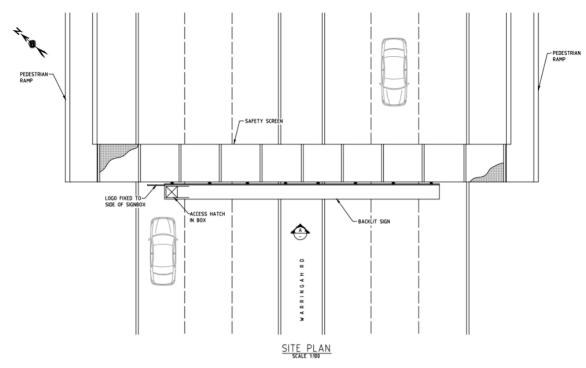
Site Plan (Source: Dennis Bunt Consulting Engineers)
